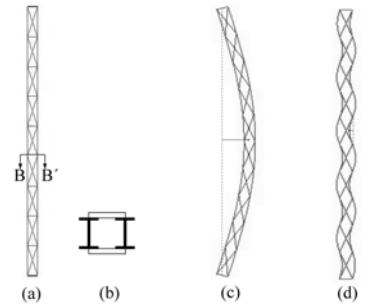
(a) Typical simply-supported laced built-up column, (b) its cross-section B-B', (c) its global buckling mode and (d) its local buckling mode.
